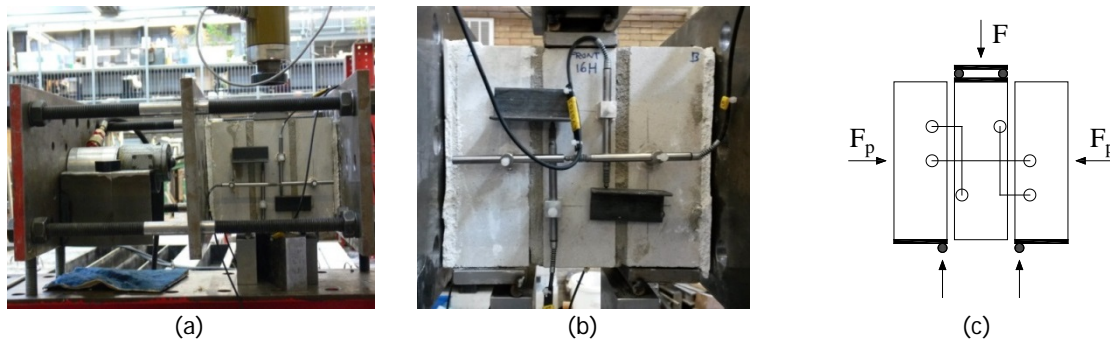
Test set-up for shear-compression test on masonry specimen.
